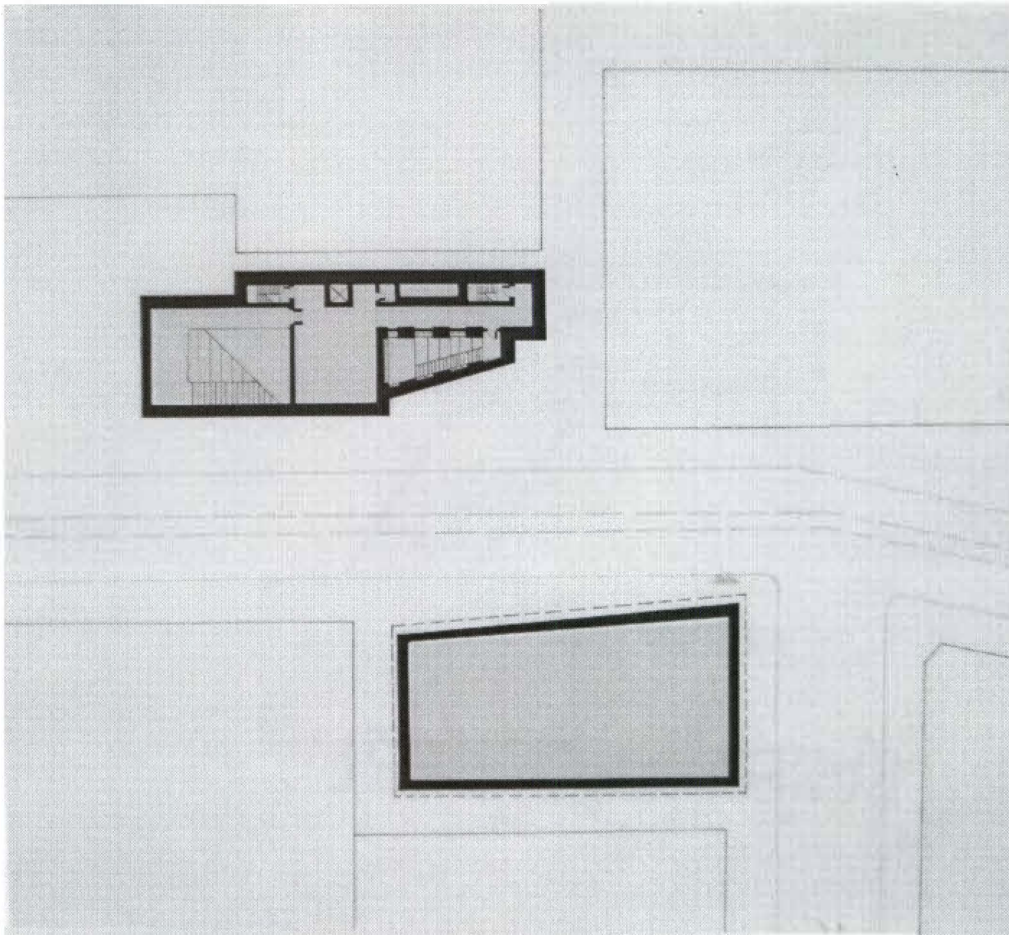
FLOOR PLAN - URBAN PLAZA AUDITORIUM FLOOR
